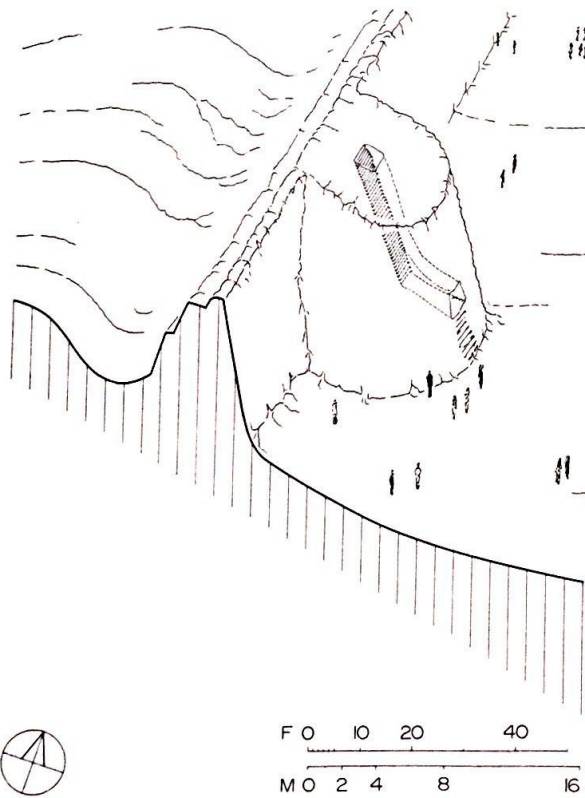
Jericho, wall and tower; section/perspective view.
